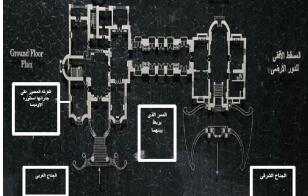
Ground Floor Plan of the Palace – Source: (Darwish, Dalia Ahmed Ahmed, 2021)
